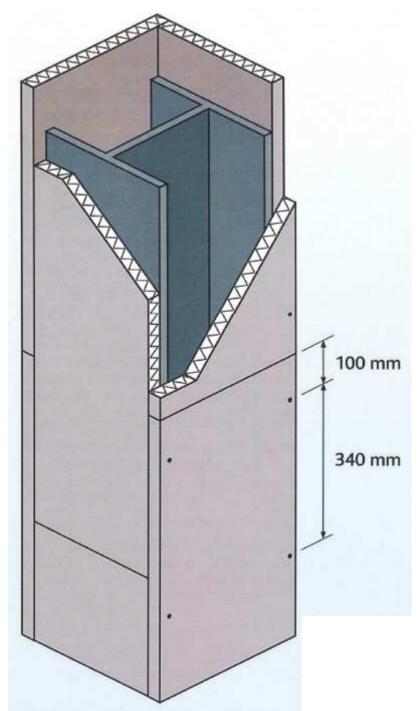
Position of screws in open profiled steel – four sided Screws 3.8×45 mm used for 25 mm fire protection Screws 5.0×90 mm used for 50 mm fire protection
